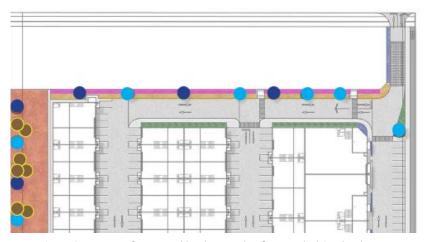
Excerpt of approved landscape plan from underlying land use consent.
